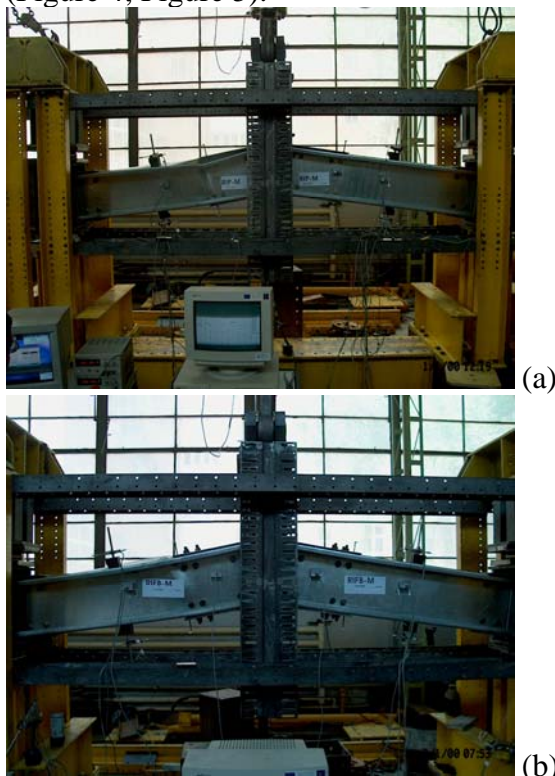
Failure of ridge specimens RIP-M (a) and RIS-FB-M (b).
